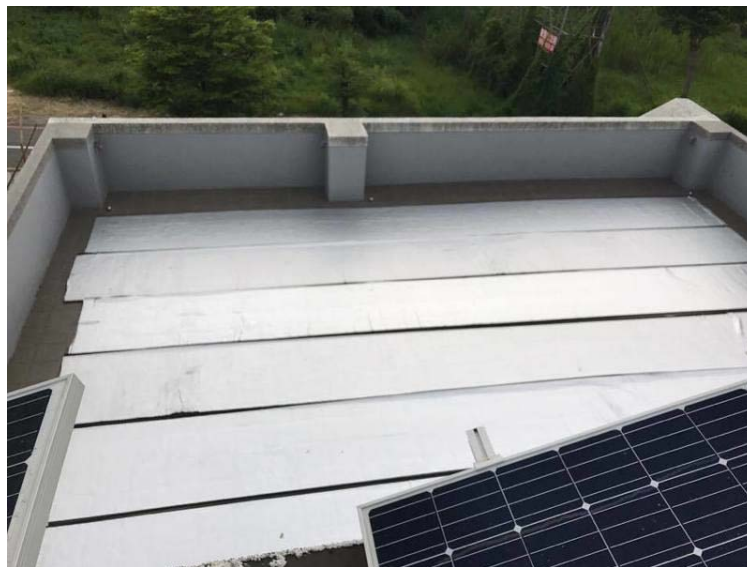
Parapet wall around the border of building. (Image credit: good.ruten.com.tw)
